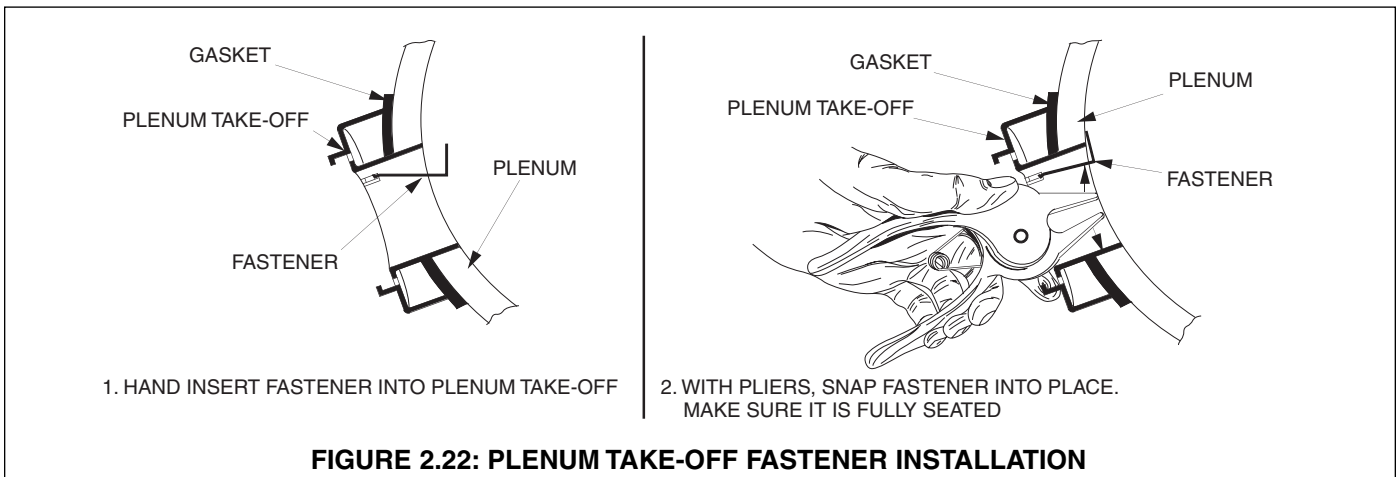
PLENUM TAKE-OFF FASTENER INSTALLATION
